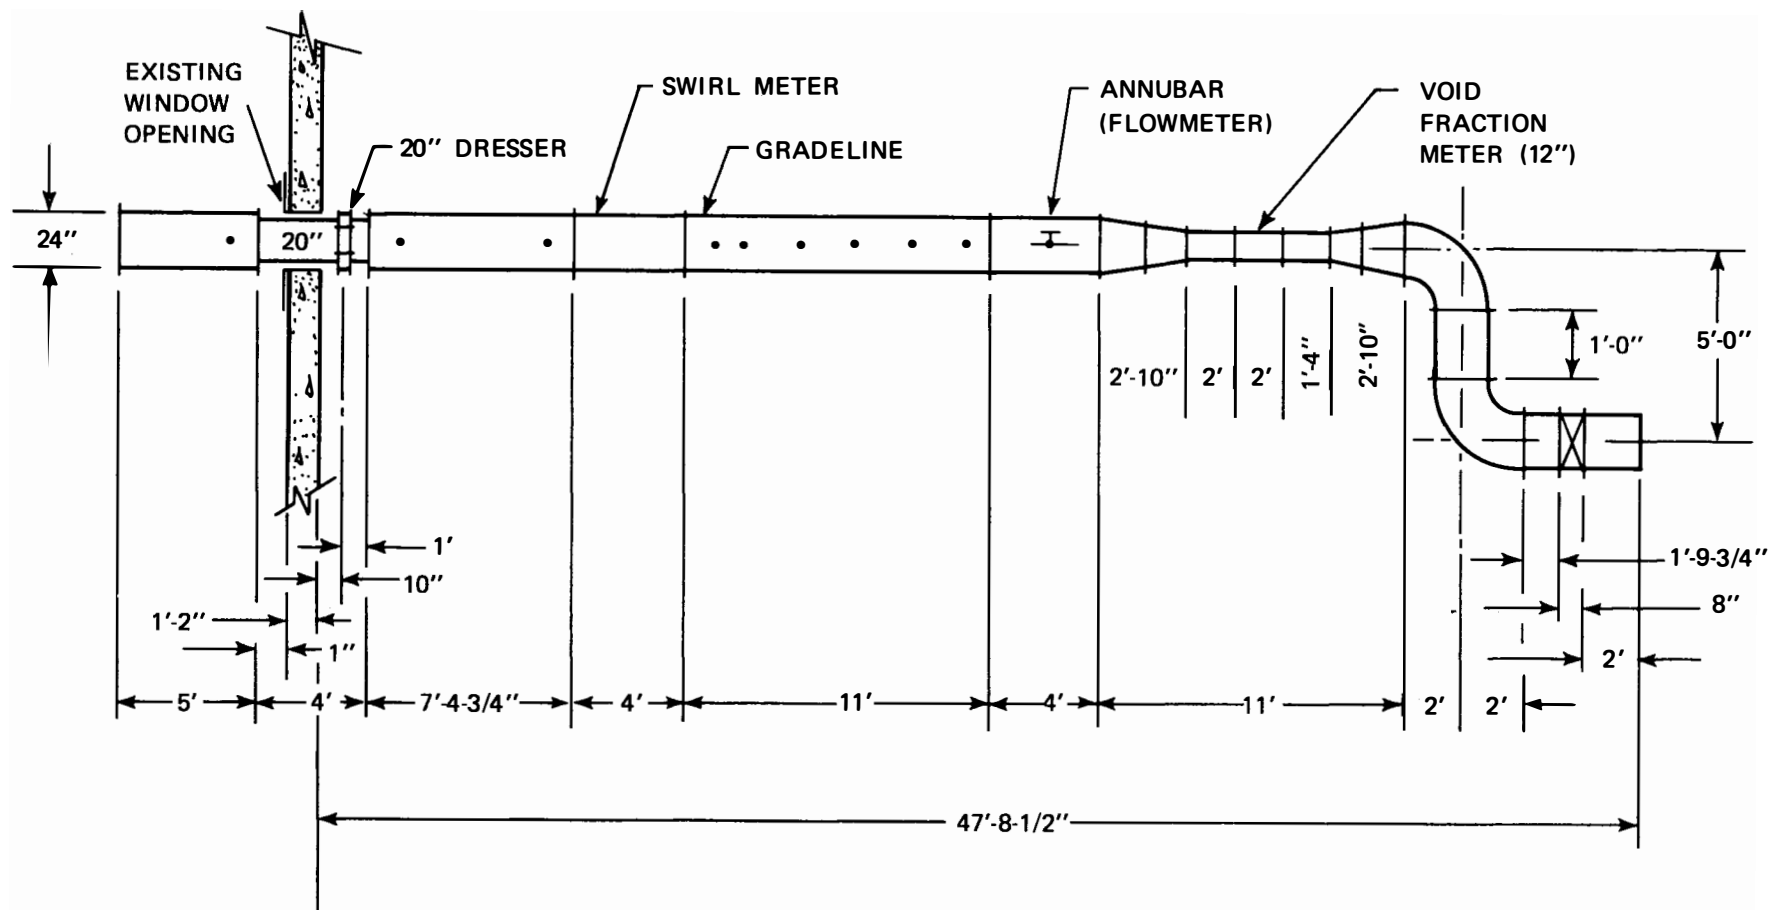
PIPING DETAILS FOR BWR CONFIGURATIONS
